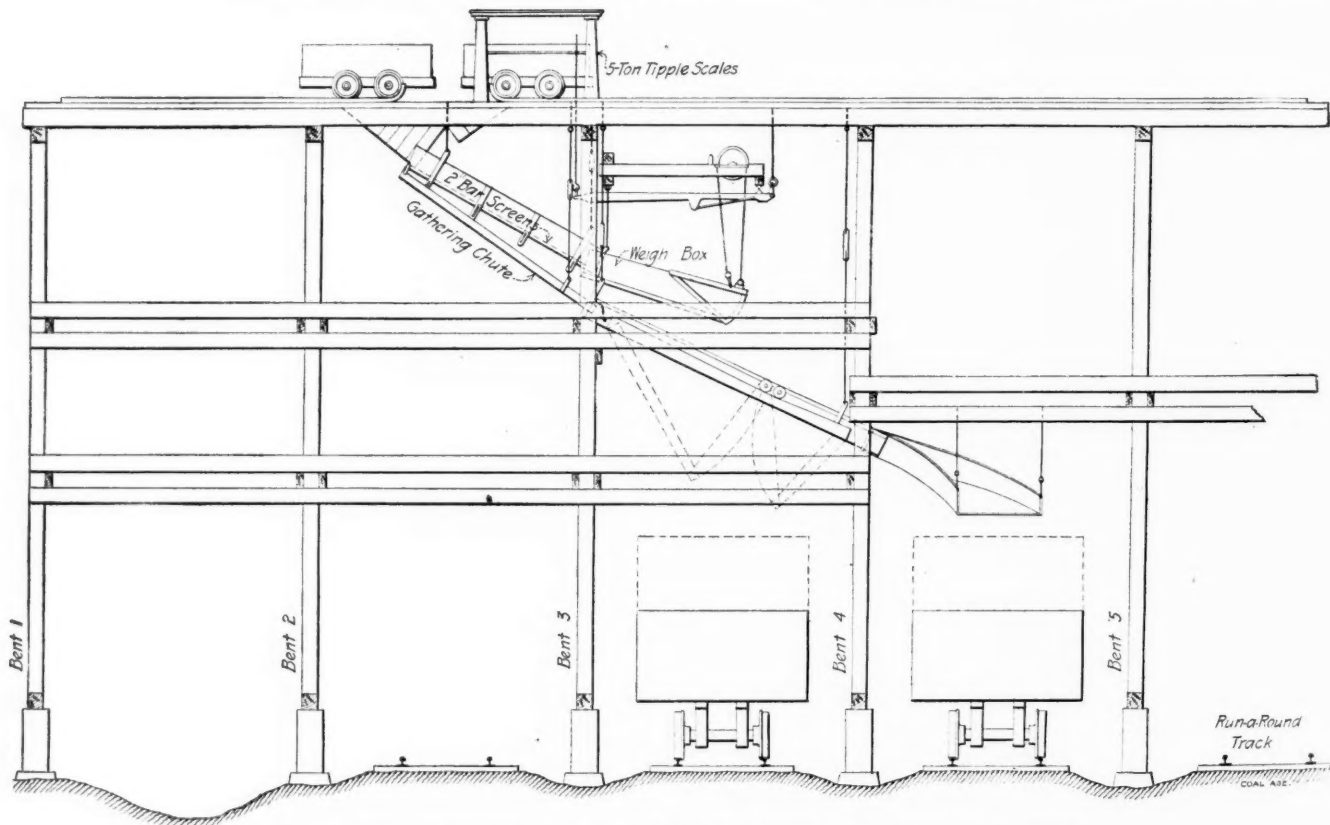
SIDE ELEVATION, SHOWING MINE-RUN DUMP AND LOADING CHUTES
